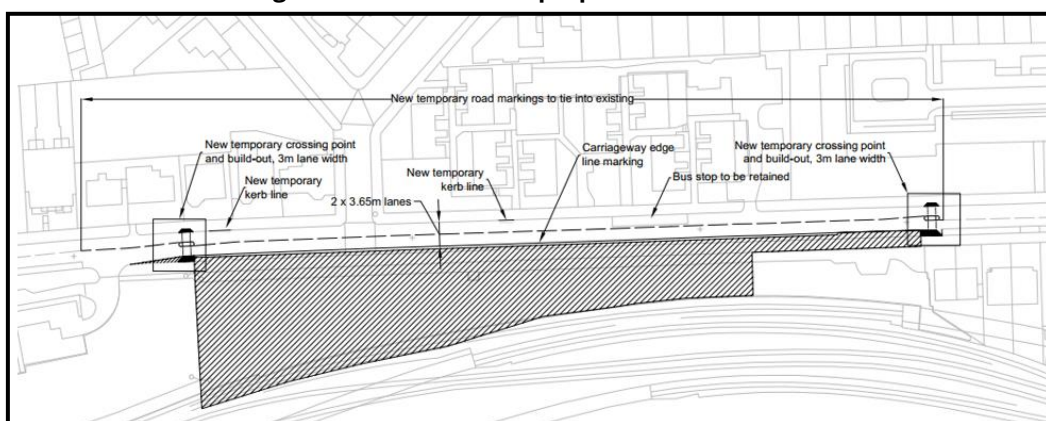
Adelaide Road proposed layout to accommodate site access requirements
